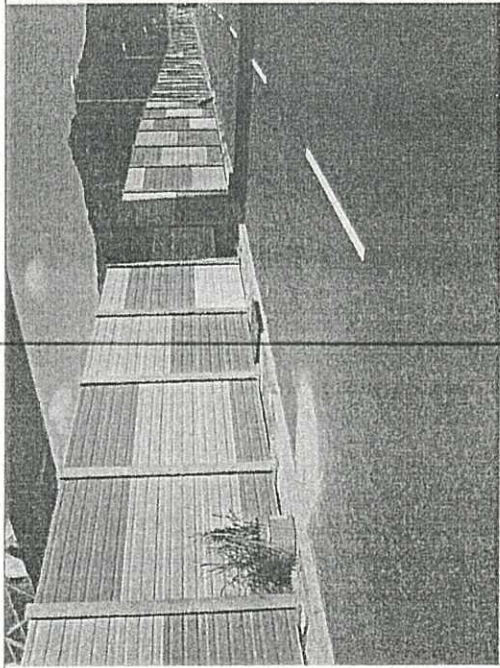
Noise barriers along the Eastern Perimeter Road
